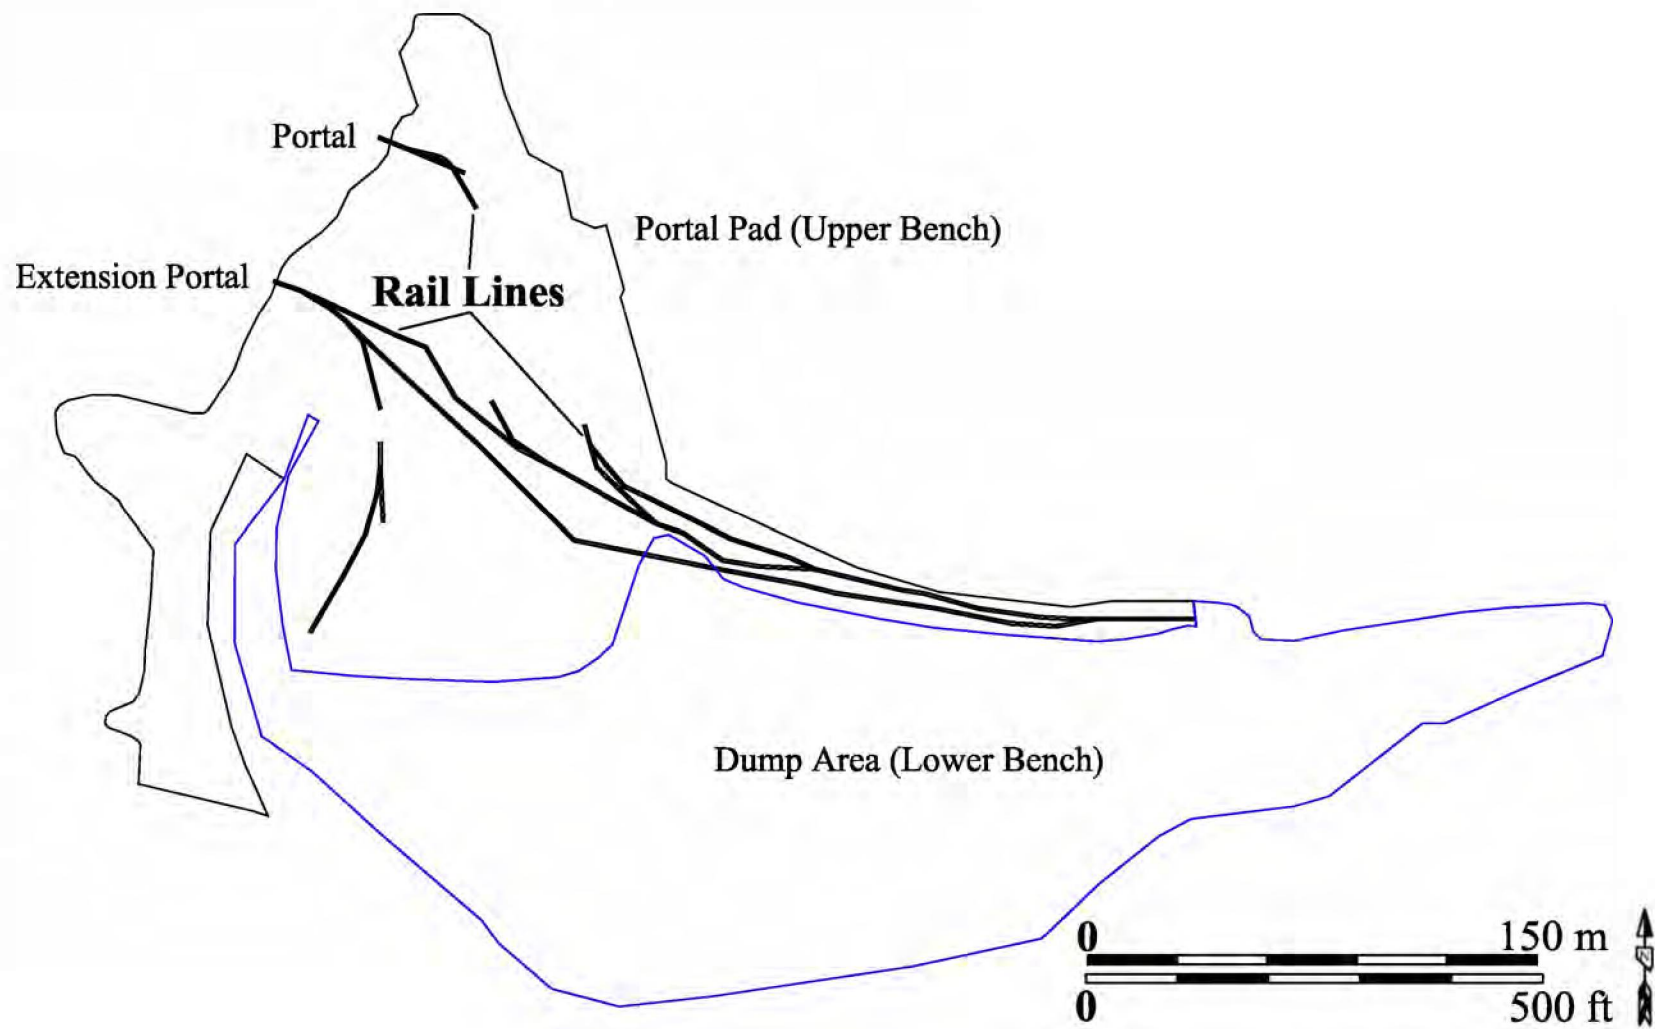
Plan map of Feature 37, rail lines, U12n Tunnel.
